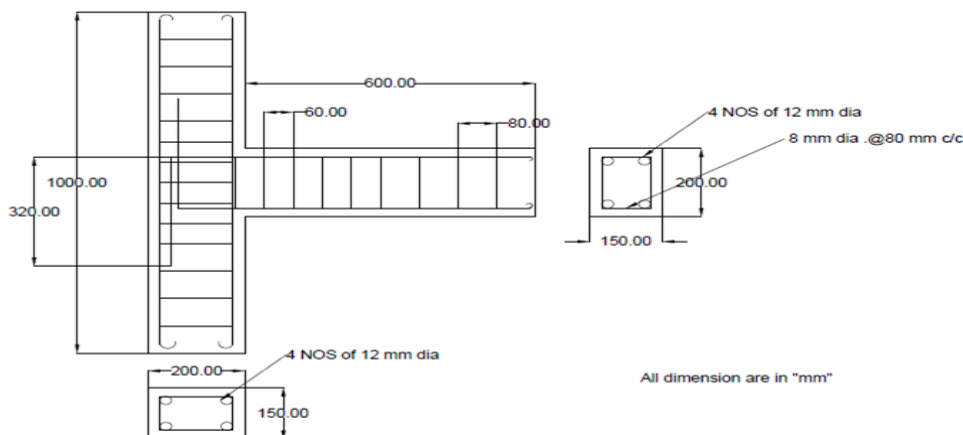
Reinforcement Detailing For Exterior Beam Column Joint
